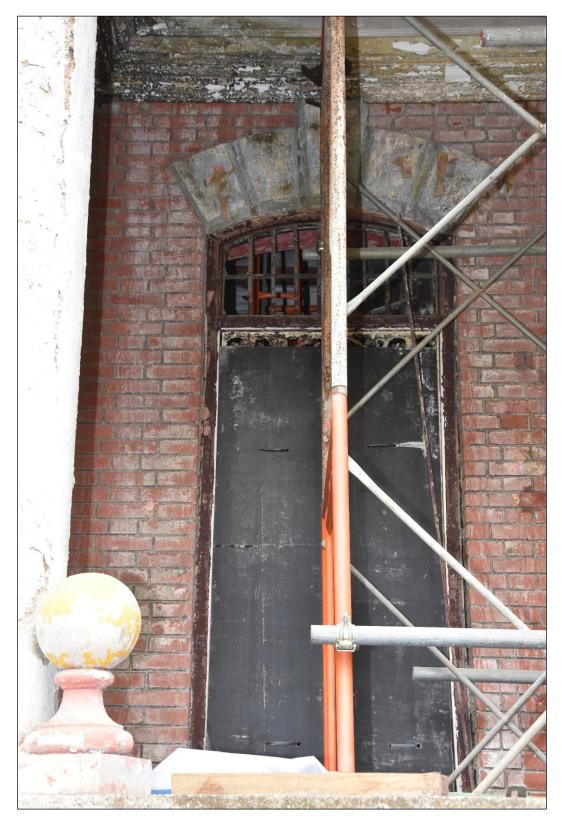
North-east elevation (front elevation), ground floor, window Wdw-Gf01, external side, the window and window grille removed, the window opening covered with plywood panel, (21st March, 2023)
